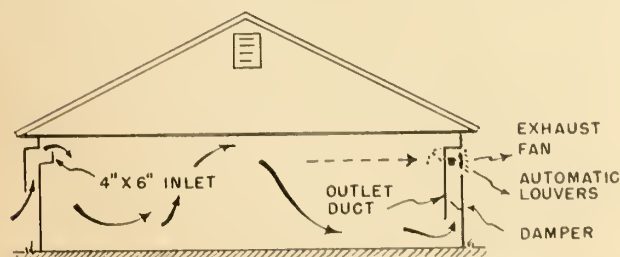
Ventilation with a wall-type exhaust fan and duct.
